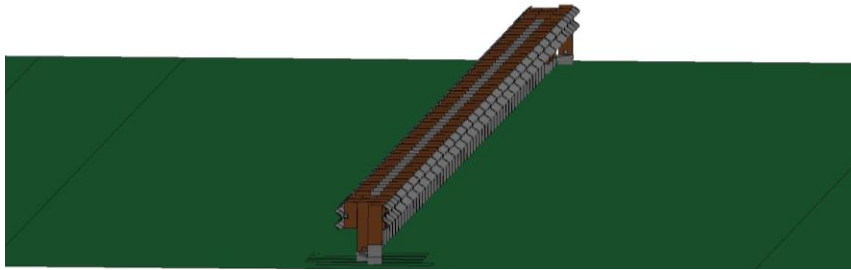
FE model of a double-faced W-beam guardrail.
